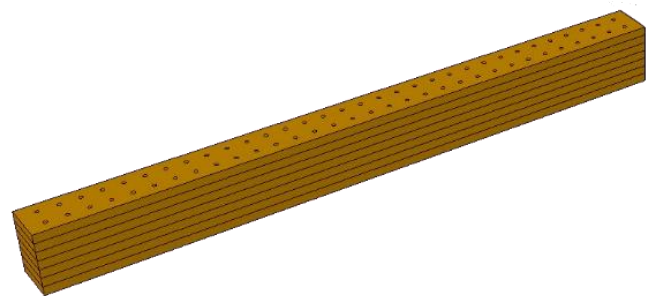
Typical dowel laminated timber (DLT) beam connected with hardwood timber dowels.
